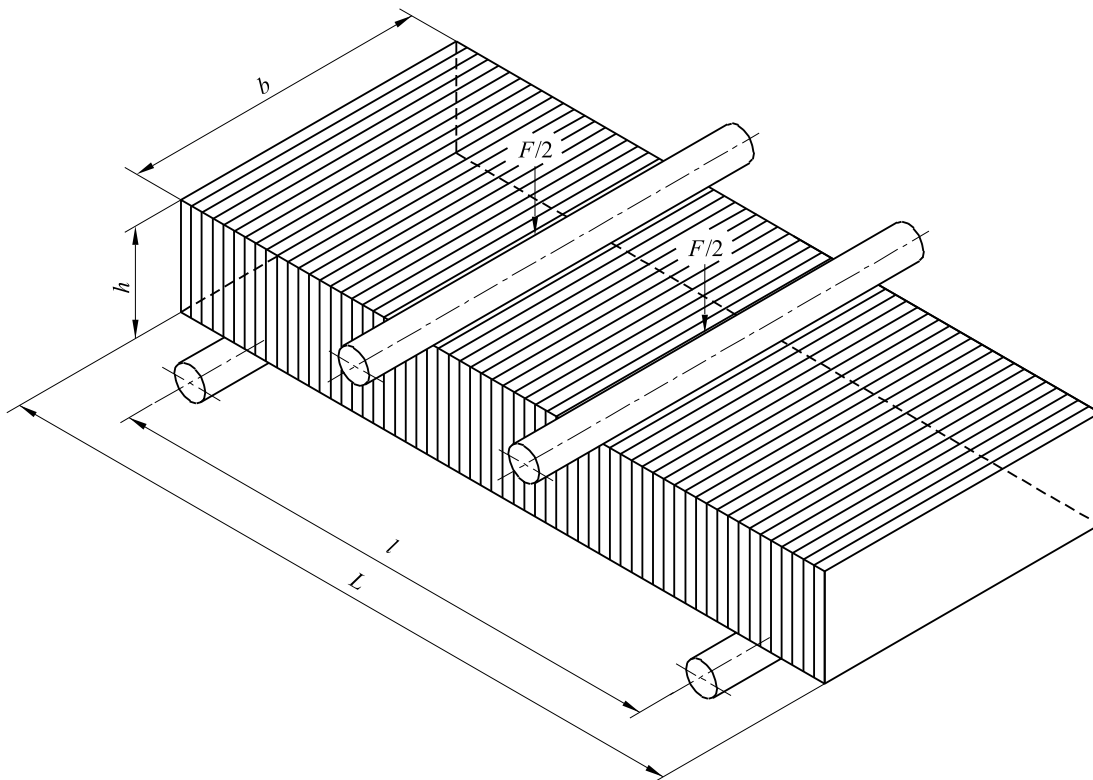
Test arrangement for a specimen with the load applied parallel to the planes of anisotropy
